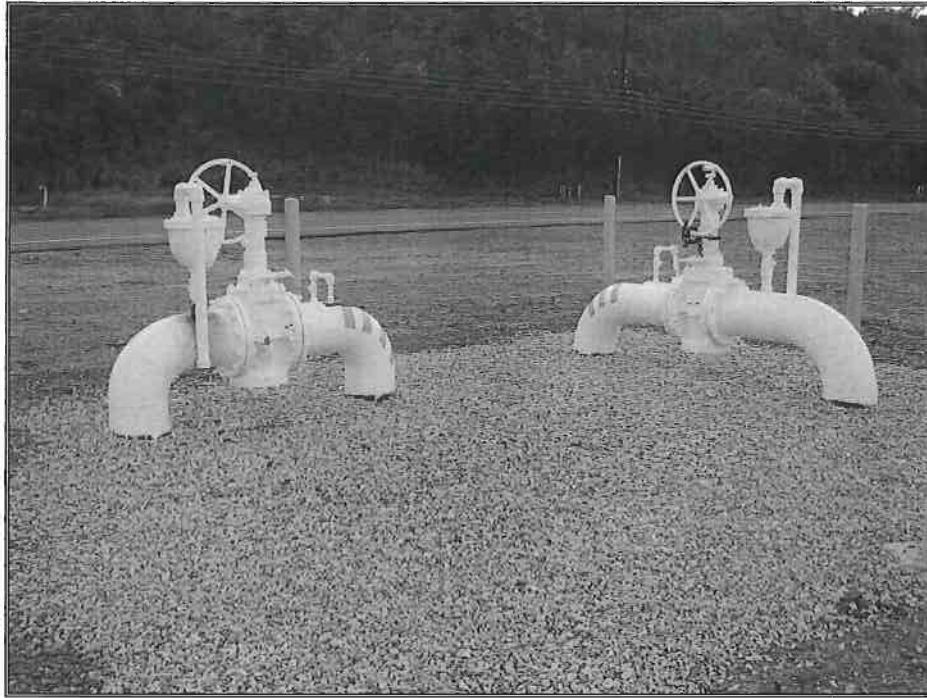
A – VP 24 Valve Setting Installation DFM and JP-5 Pipelines to Pier 3
